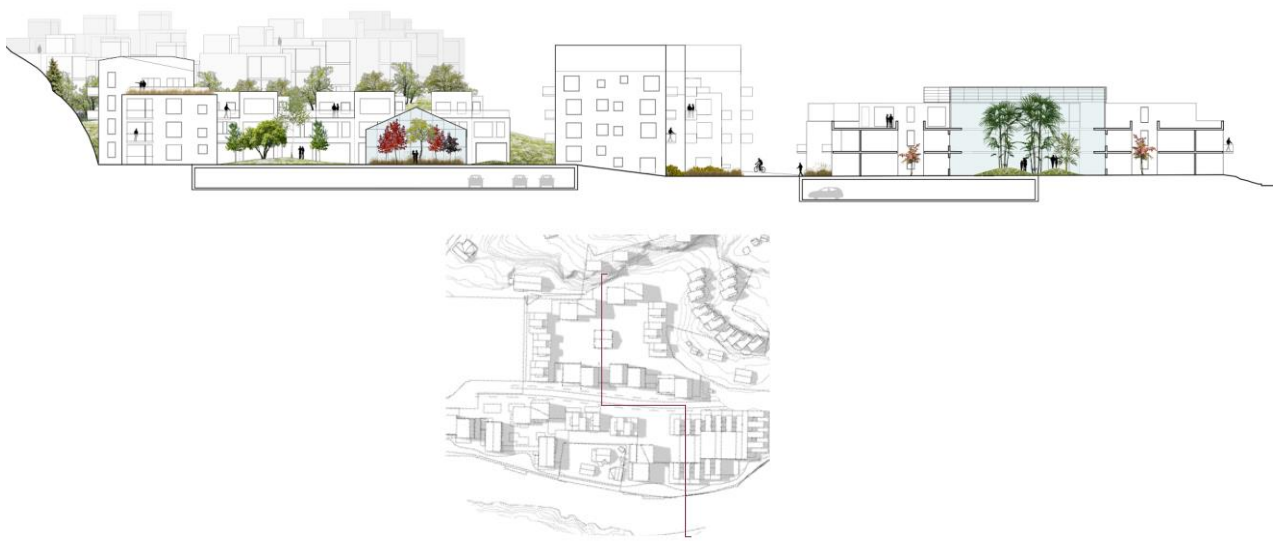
Section of a building competition. Source: image courtesy Grape Architects
